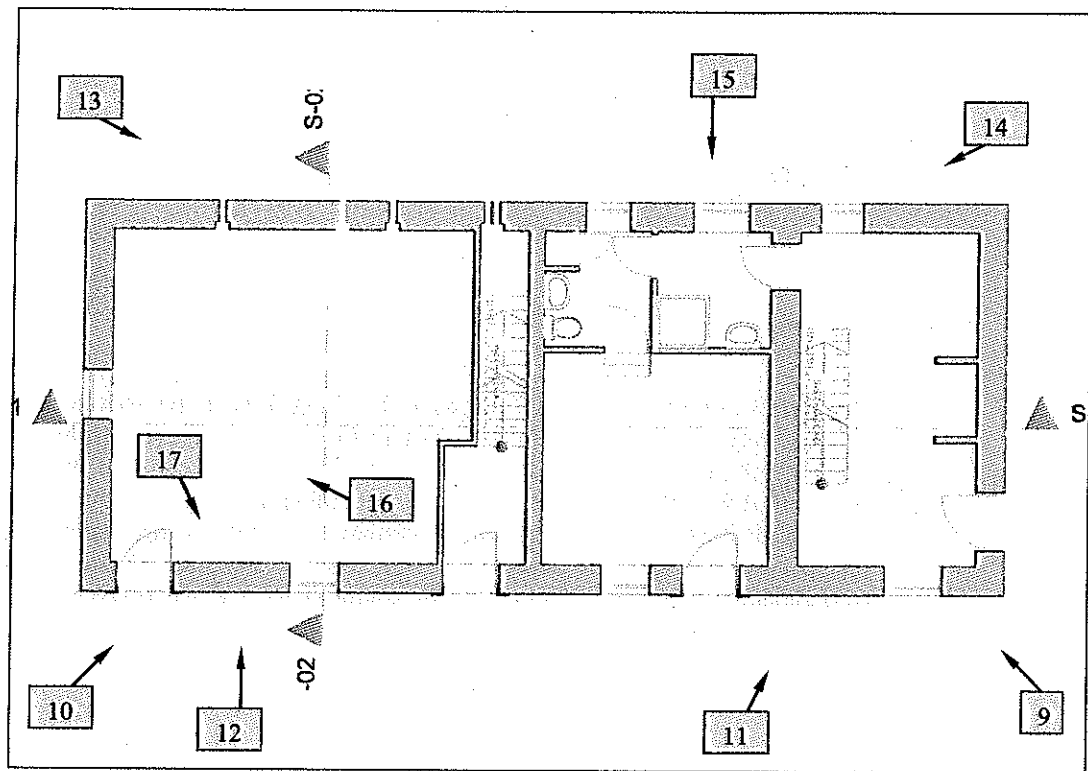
Ground floor plan and image viewpoints (Anderton Gables Chartered Building Surveyors)
